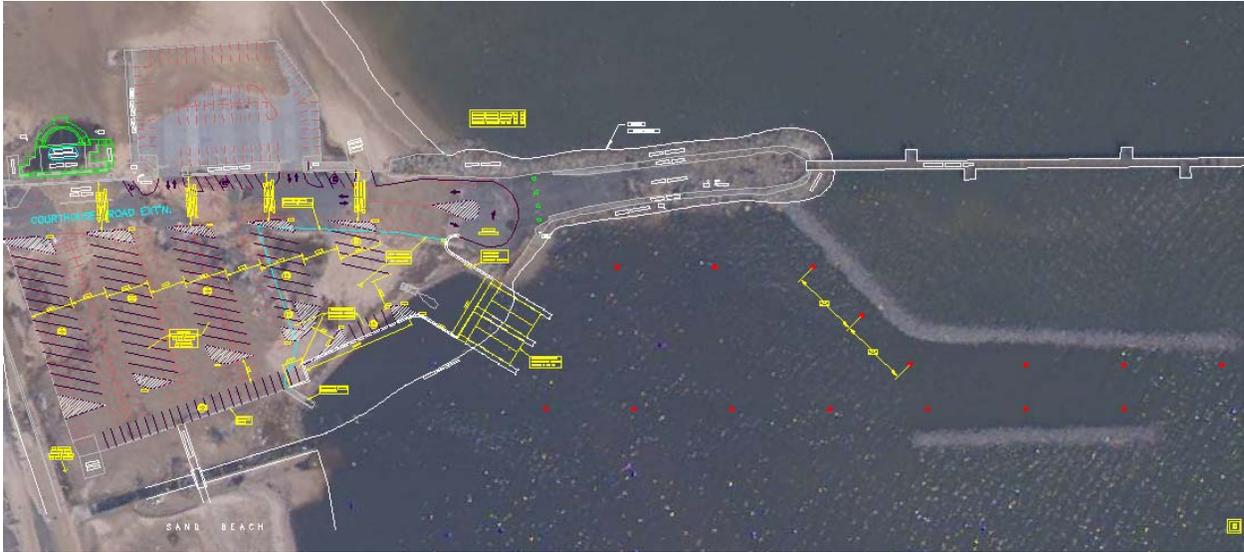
Plan of Improvements Overlain on Post-Katrina Photo. Jetty construction was progressing towards land as in Figure 4.4. Design by Brown and Mitchell, Gulfport, MS
